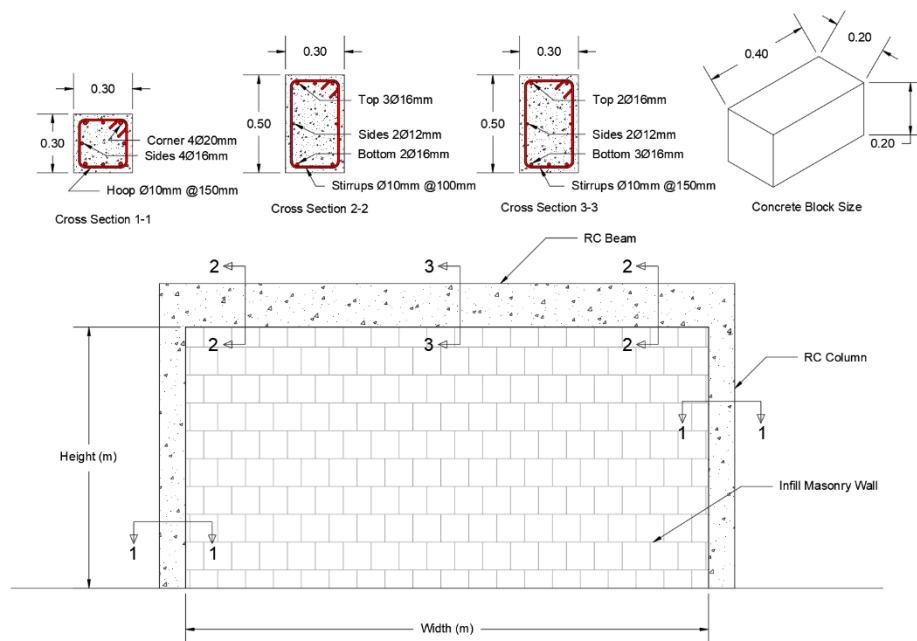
Infill masonry wall arrangement and frame reinforcement detail (units are in meters).
